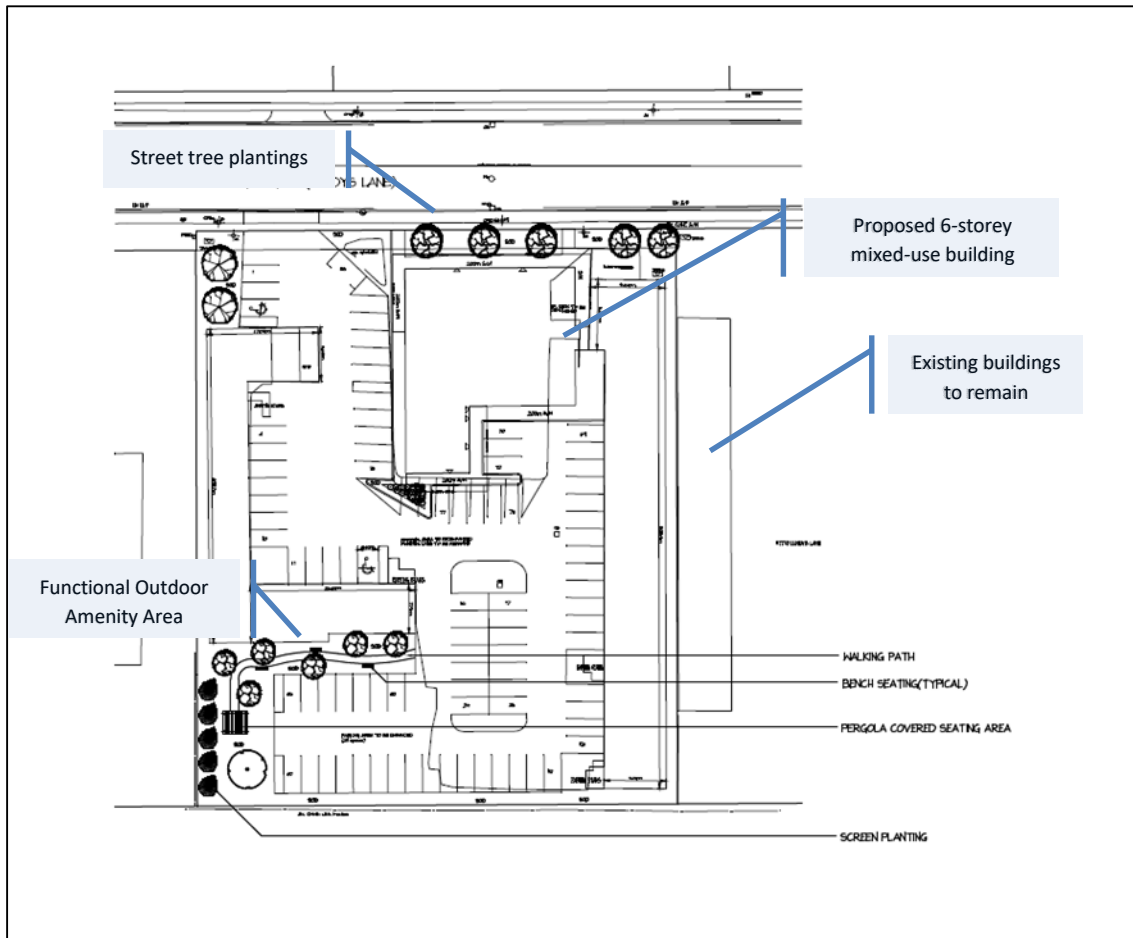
Proposed Site Plan with Landscaping (Landscape Florida)
